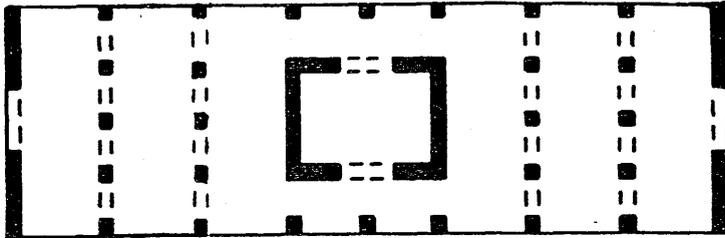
Typical layouts of high-rise buildings with shear wall-frame interaction
